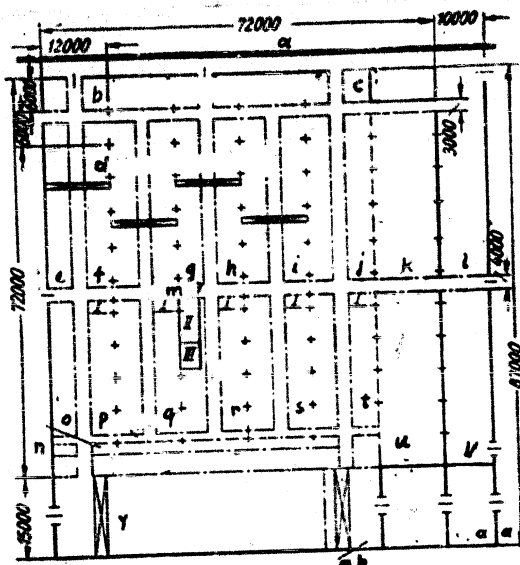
Typical Scheme of General Components in One Building of Mechanical, Assembly, Tool and Mechanical-Repair Shops of Machine-Building Works of Series Production
